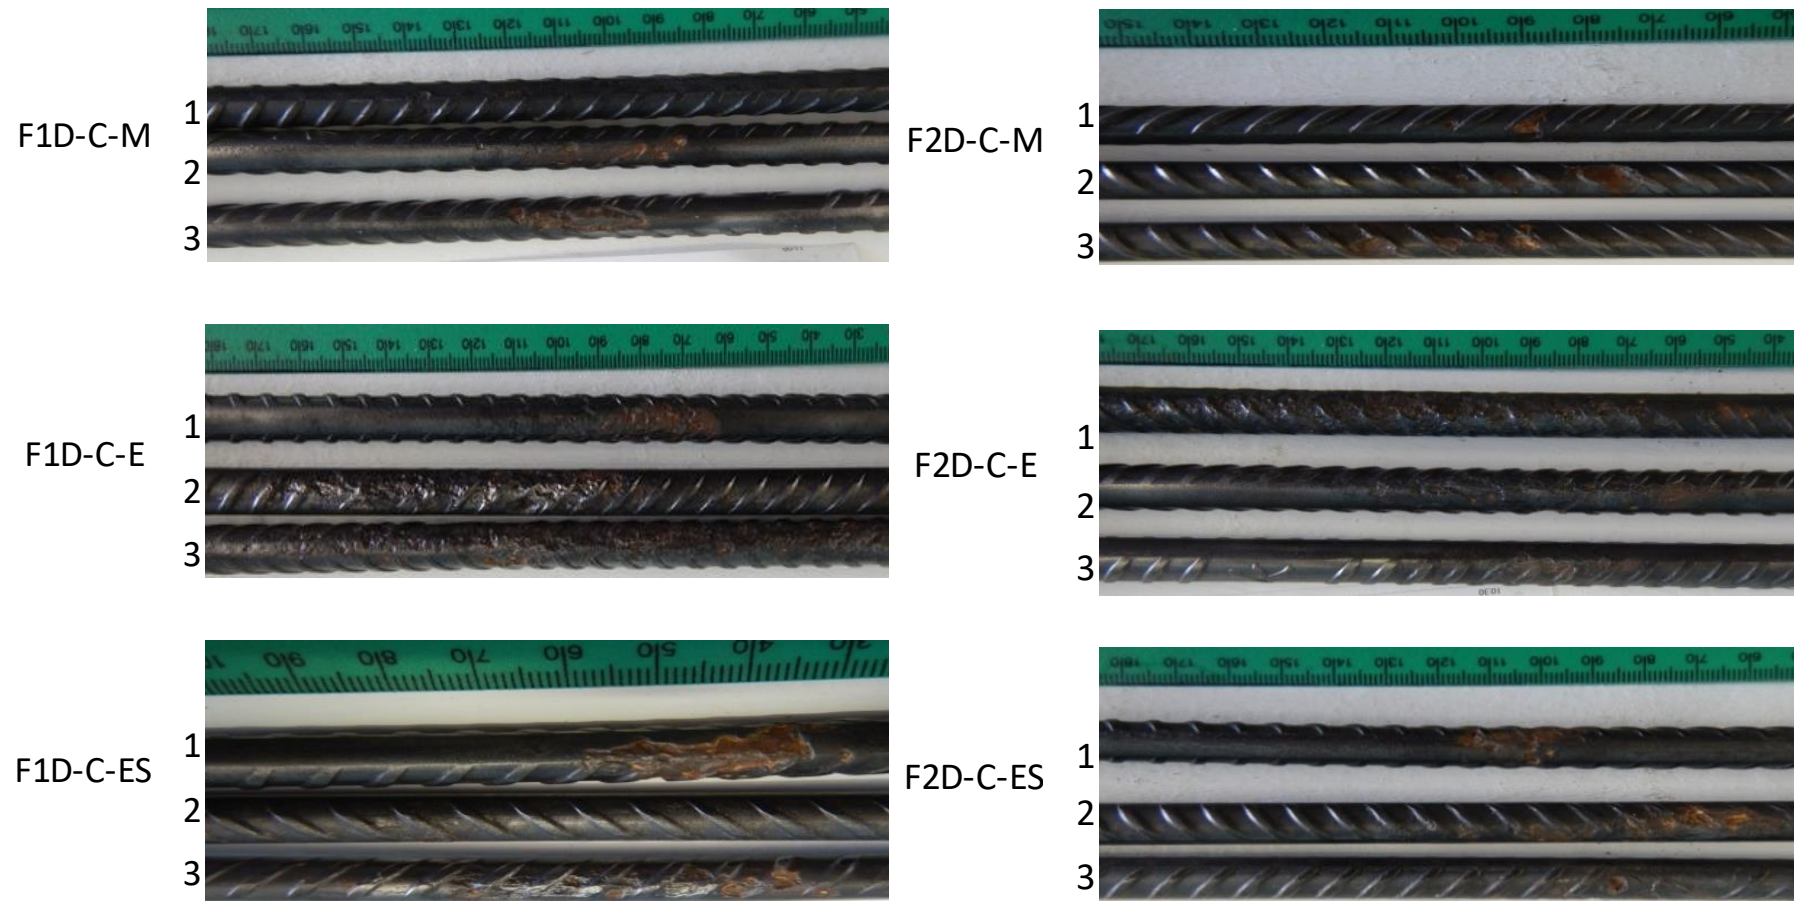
Photograph of corroded reinforcement bars from cracked PC/FA concrete specimens
